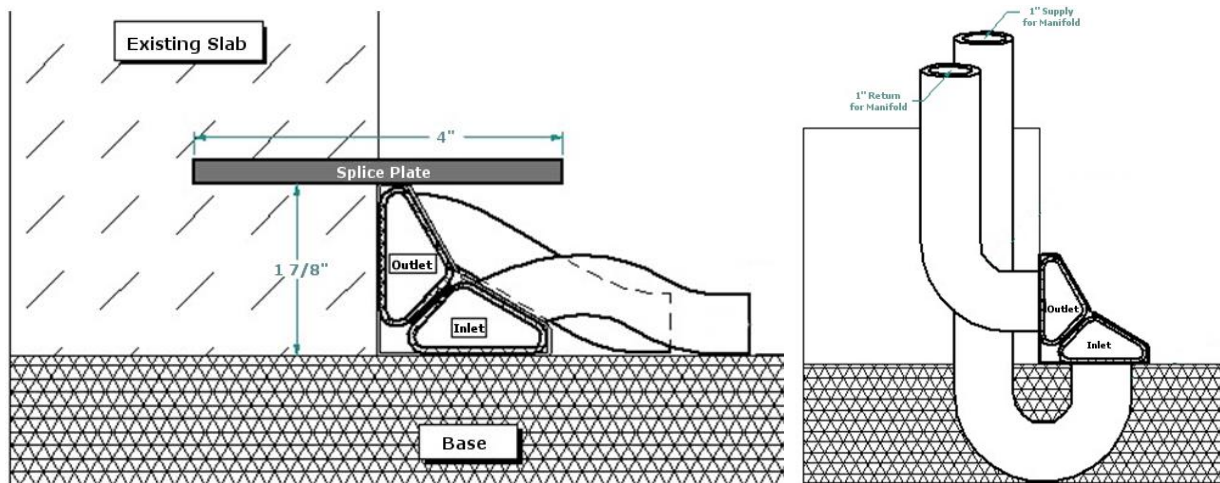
Manifold design with two triangle shaped HDPE extruded tubes
